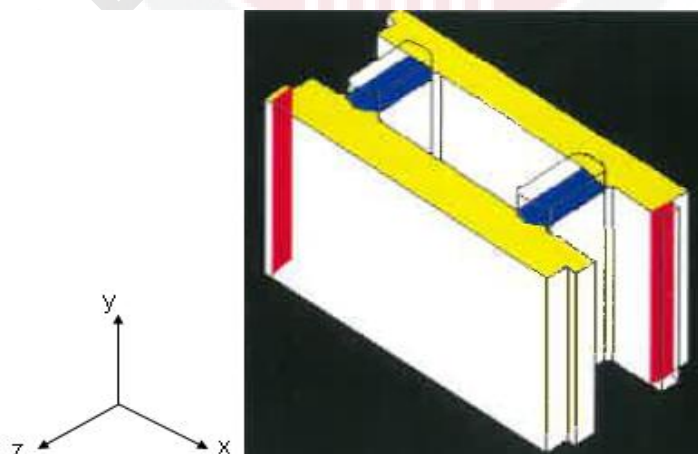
Shear areas of stretcher Putra block (Final Report of Interlocking Load Bearing Hollow Block Building System, 2004)
